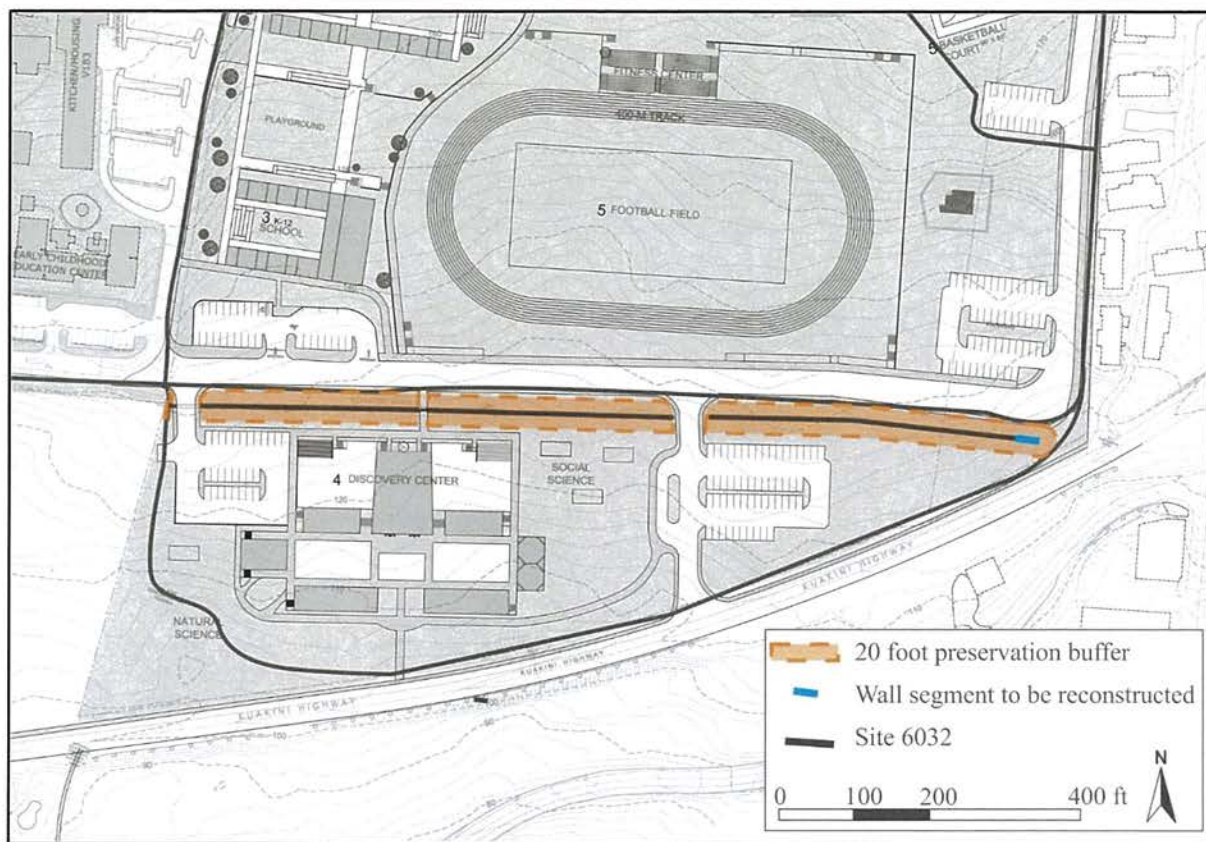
Detail of development plan with Site 6032 and preservation buffer indicated.
